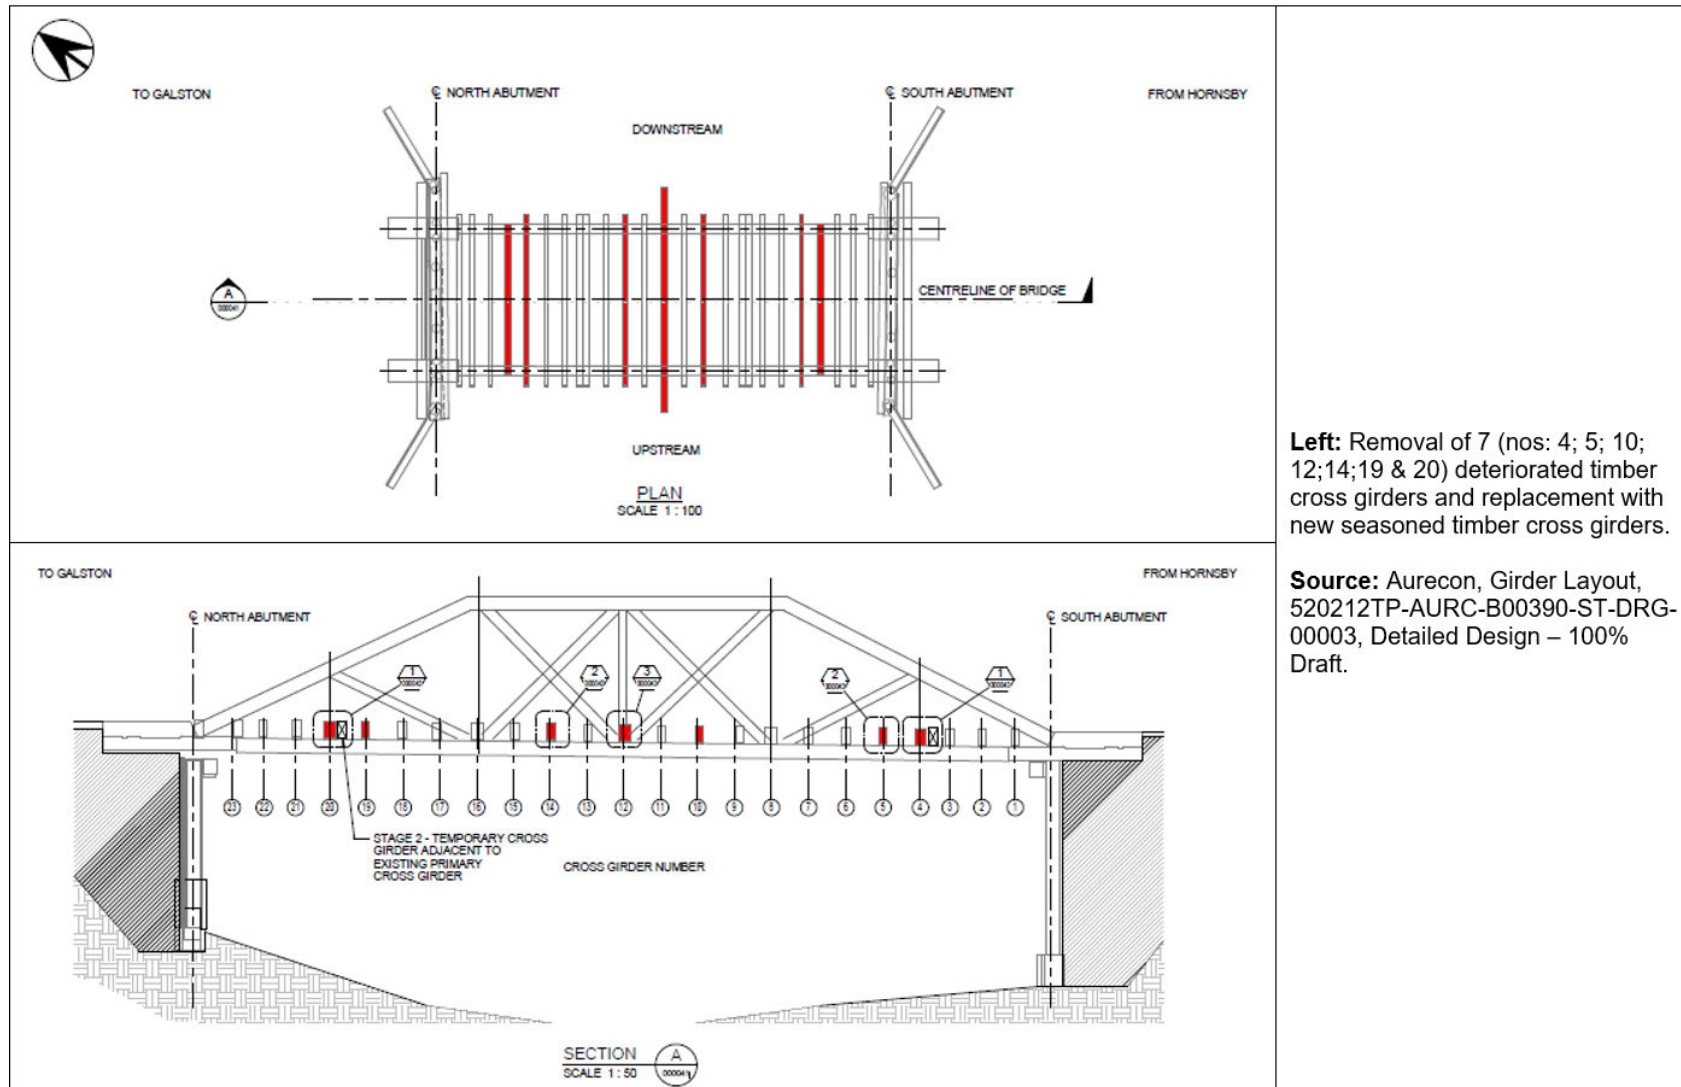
Excerpt from detailed design showing timber cross girders to be removed. (Source: 100% Detailed design drawing 520212TP-AURC-B00390-ST-DRG-00003)
